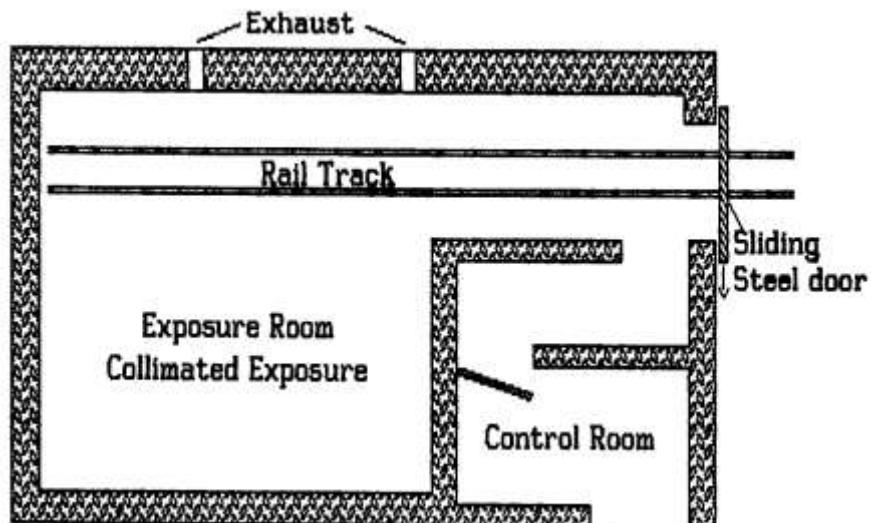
Enclosed Installation (Radiography Room with sliding door Entry System)
